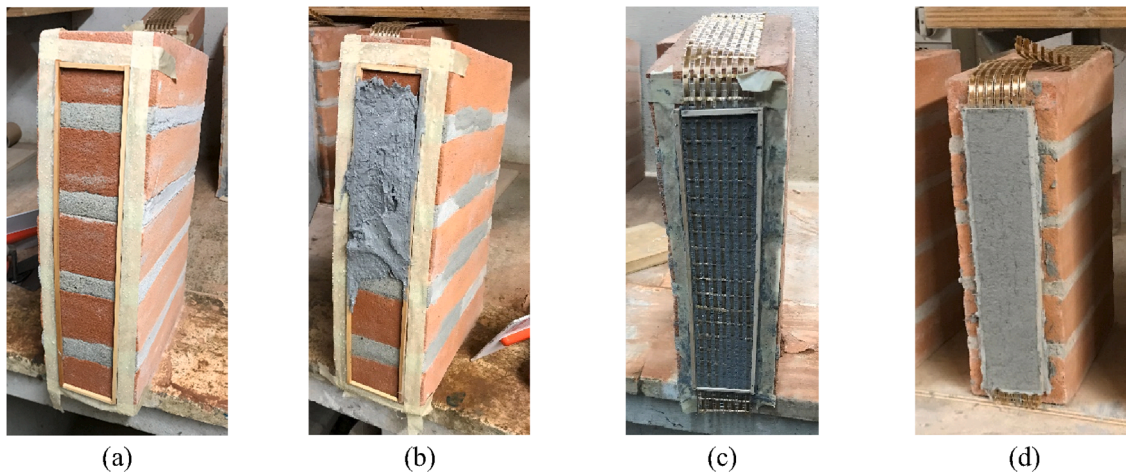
Preparation of the reinforced masonry pillars: a) first wood frame; b) first layer of mortar; c) application of the PBO mesh and second wood frame; d) second layer of mortar.
